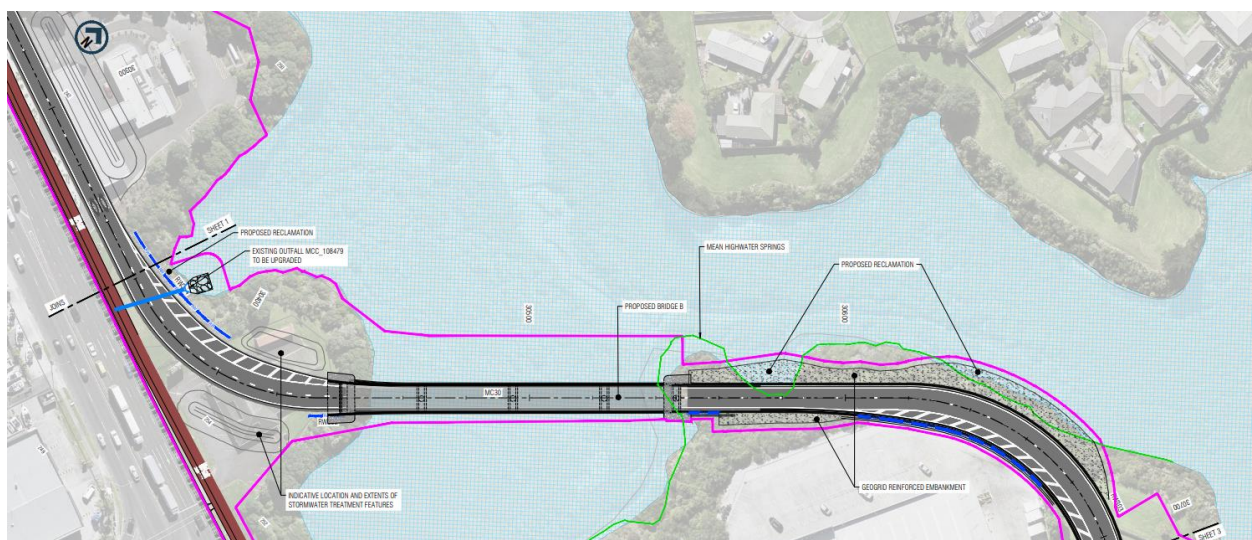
Bridge B and embankment in relation to MHWS position (green line).
